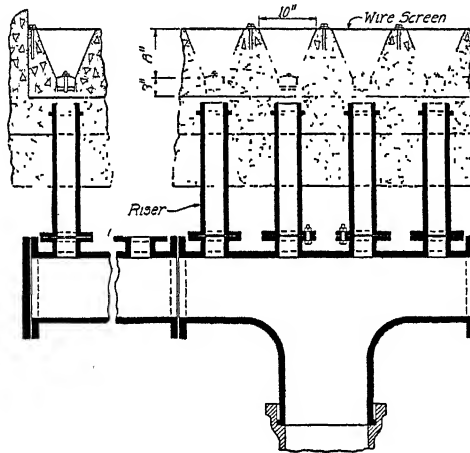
Section Showing Details of Strainer for the Filtering Plant at Cincinnati, Ohio
